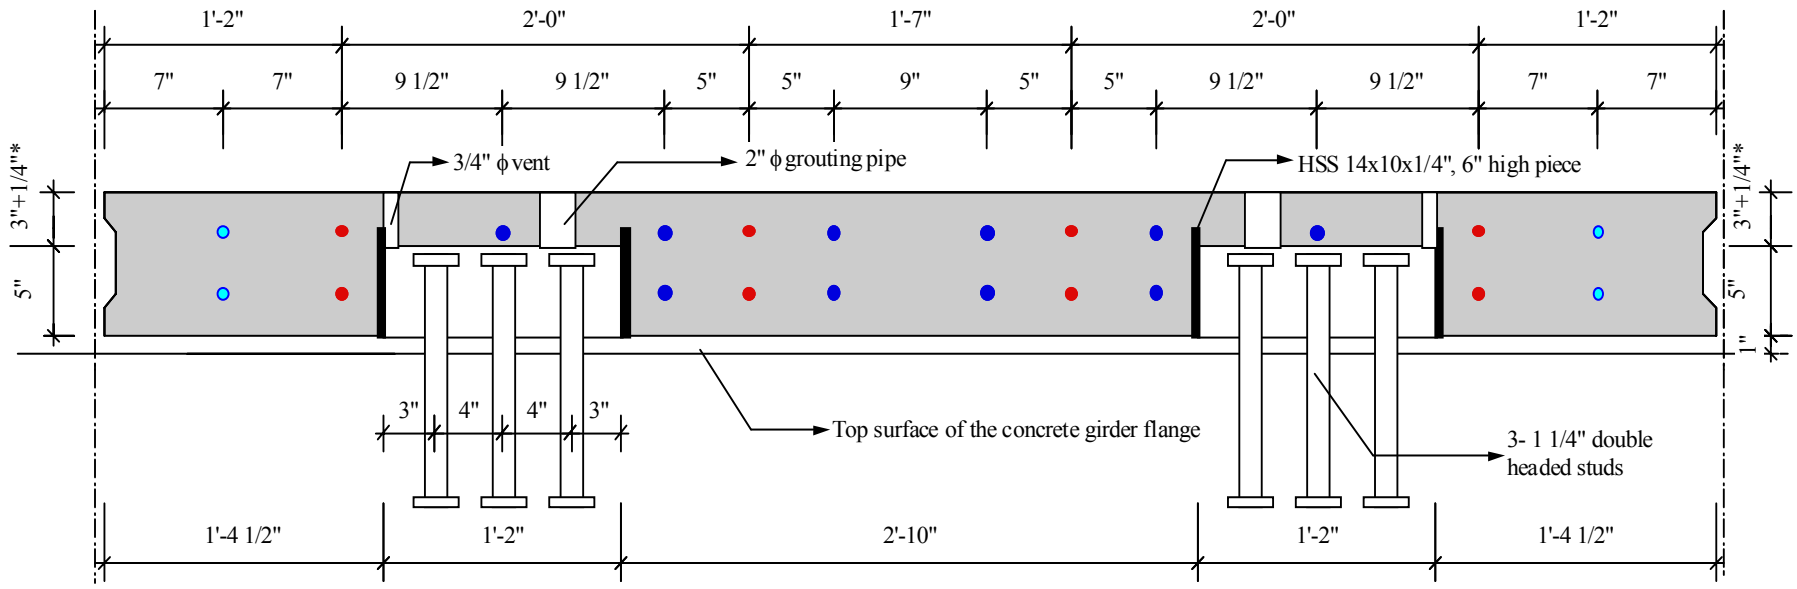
CD-1, Sections C-C & E-E for Concrete Girders
